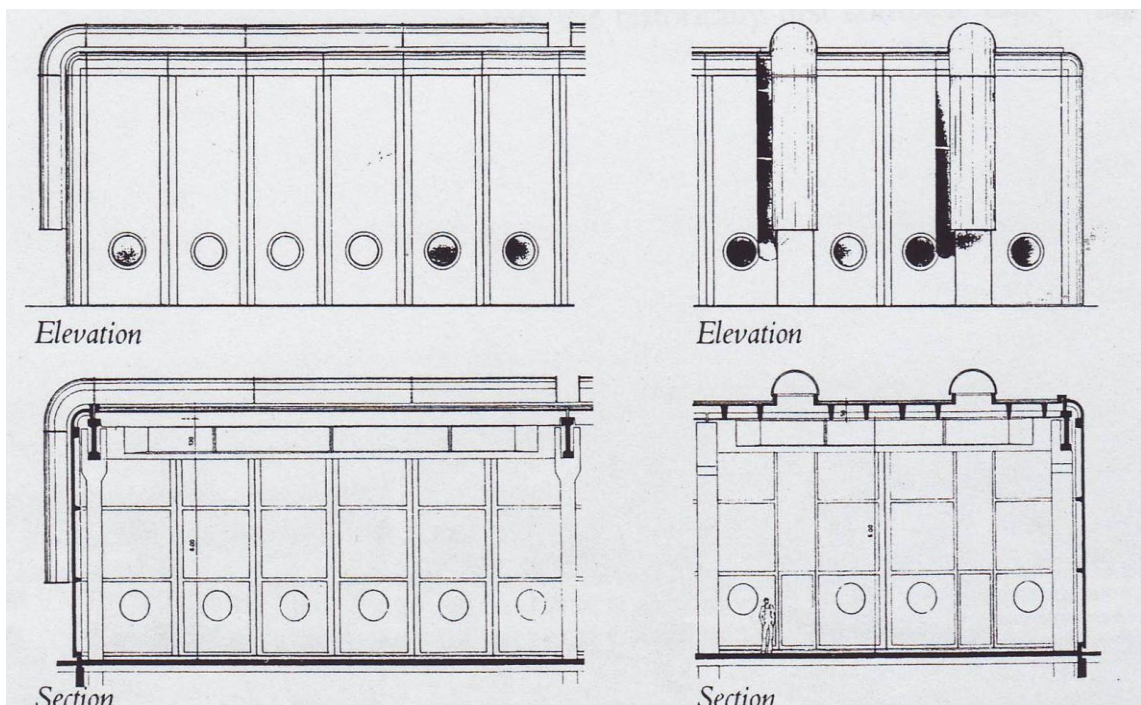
Lassa Tyre Factory, elevations and sections showing the prefab panels and natural lighting system through polyester tubes. (Mimar, 1985).
